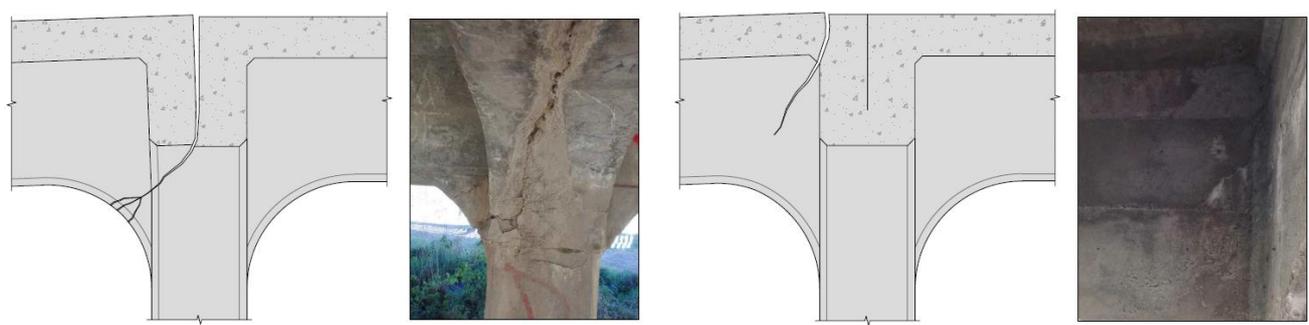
Critical joint failure mechanisms and examples of similar cracking on site
